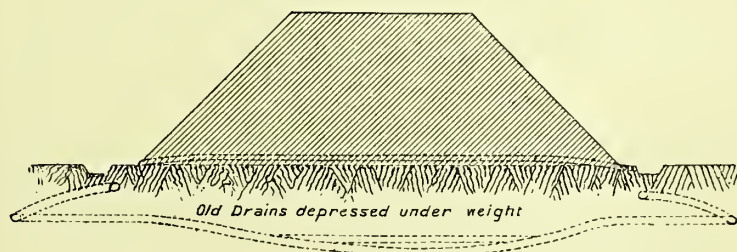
Section through Railway Embankment, showing Depression of Drains.
